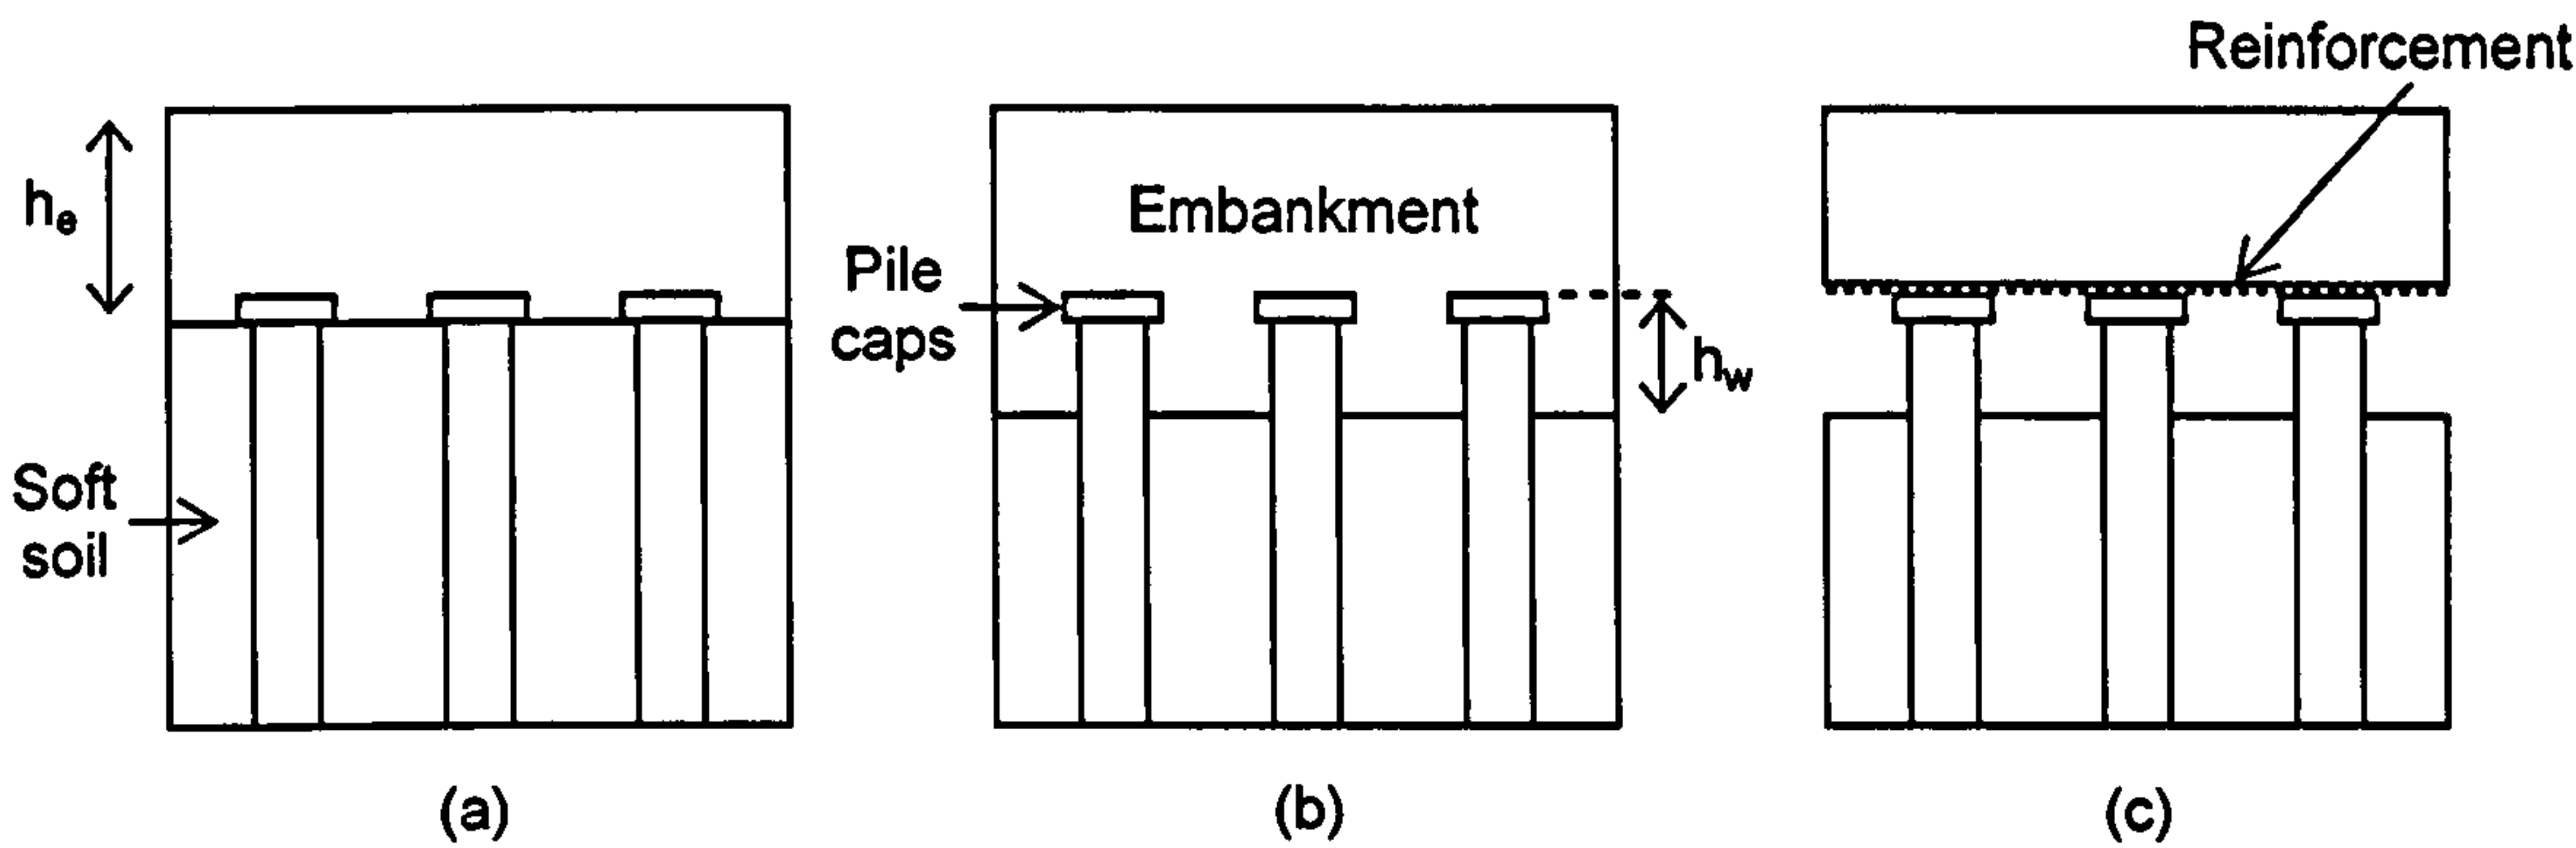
Tests performed: (a) Piled embankment, (b) working platform, (c) reinforced piled embankment (3×3 pile group shown, not to scale)
